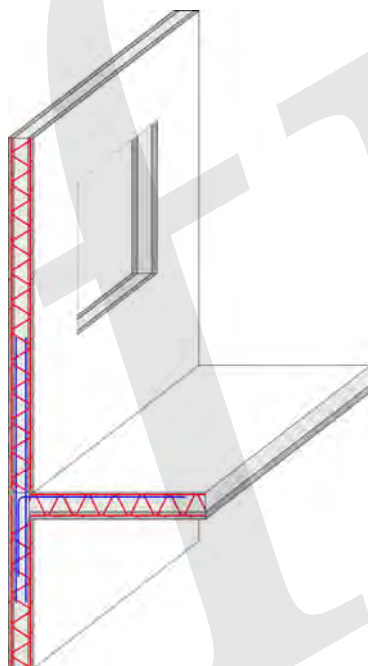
Intersection between twin wall panels and composite floor slab (connecting site fixed bars coloured blue).
